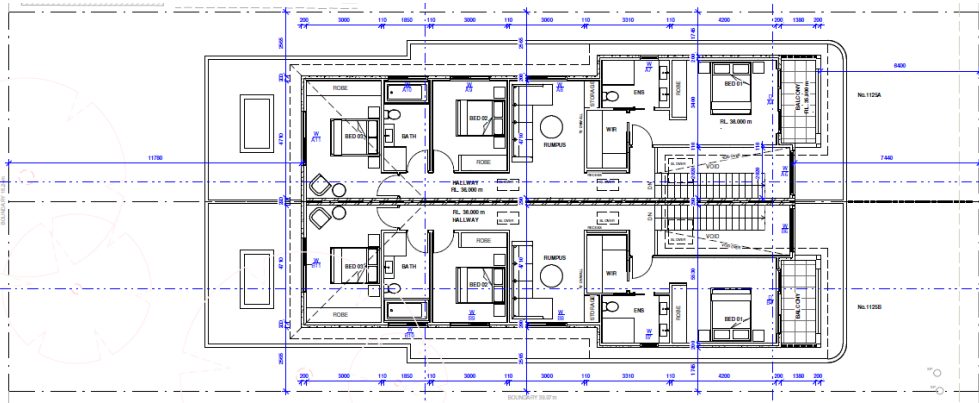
Proposed first floor plan - 1125 Anzac Parade, Matraville (Source: Cantilever)
